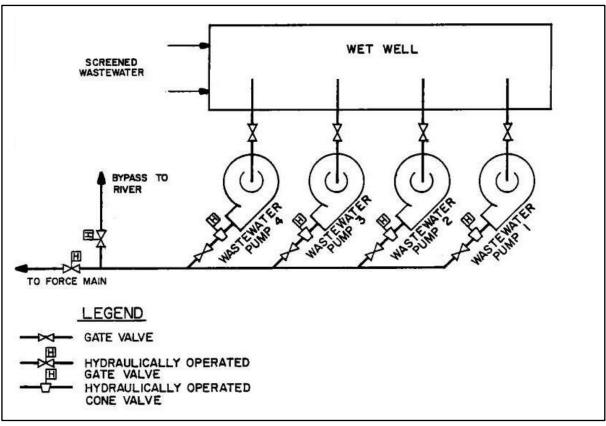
Front Street Pump Station - Wastewater Pumping
